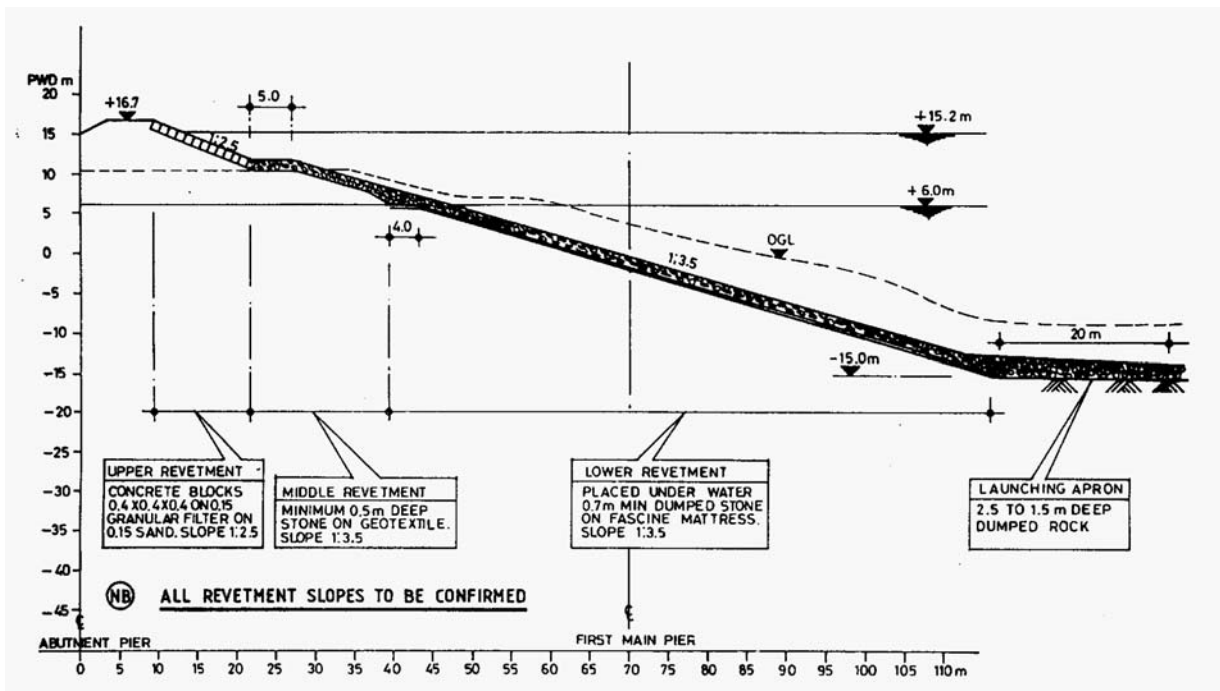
(c) Paksey Bridge: Cross Section of Guide Bank
